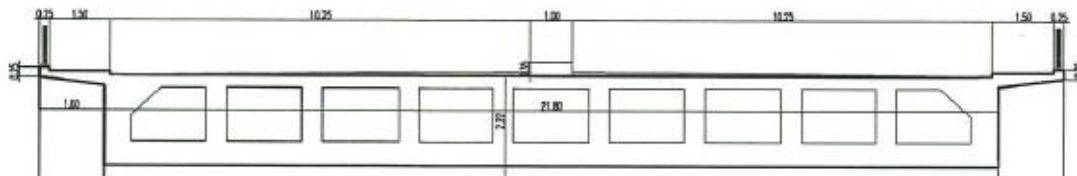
Cross section of arch slab near the fixed ends (section 4-4)
